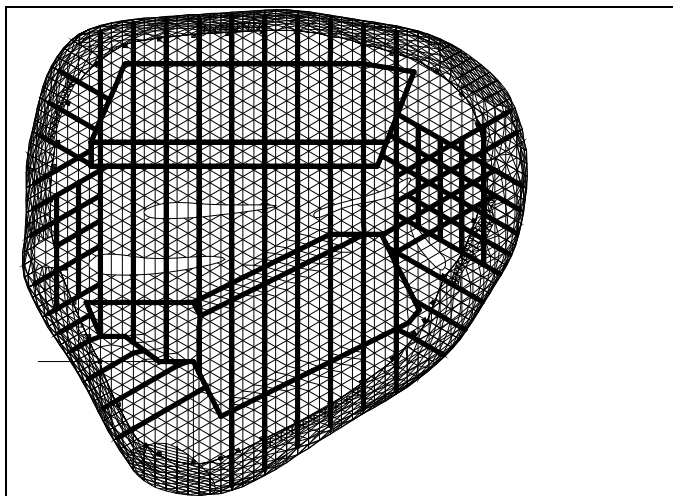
Plane layout of stiffened single-layer latticed shell scheme
